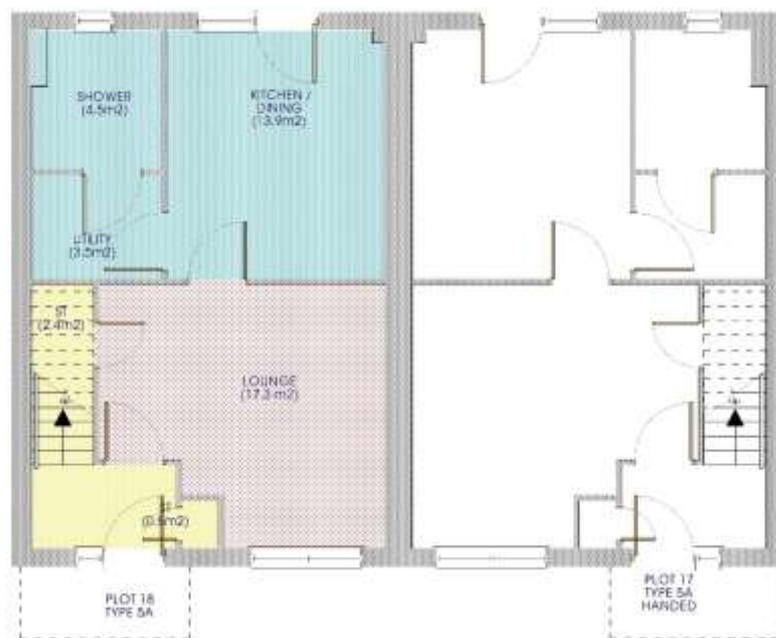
Ground floor plan – Control house plot 17 (right) - block 06
